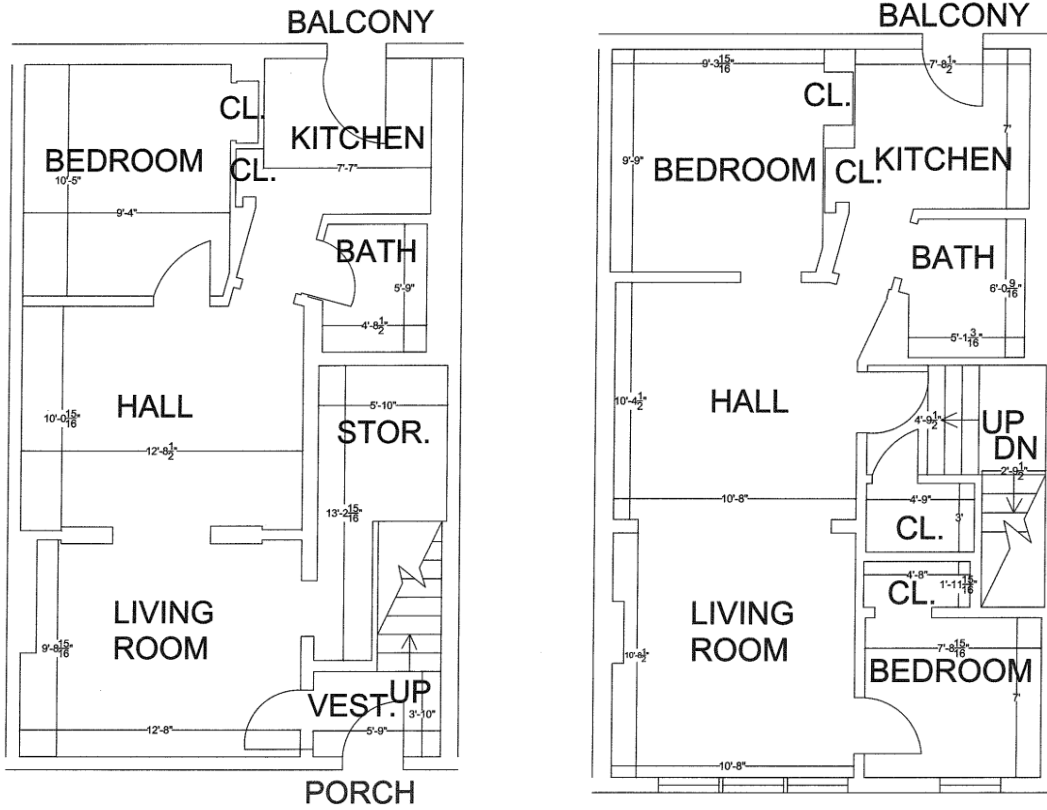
of 9. Floor plans of the first and second floor apartments. Drawn by Linda Williams/ShotgunHaus Designers and used with permission.
